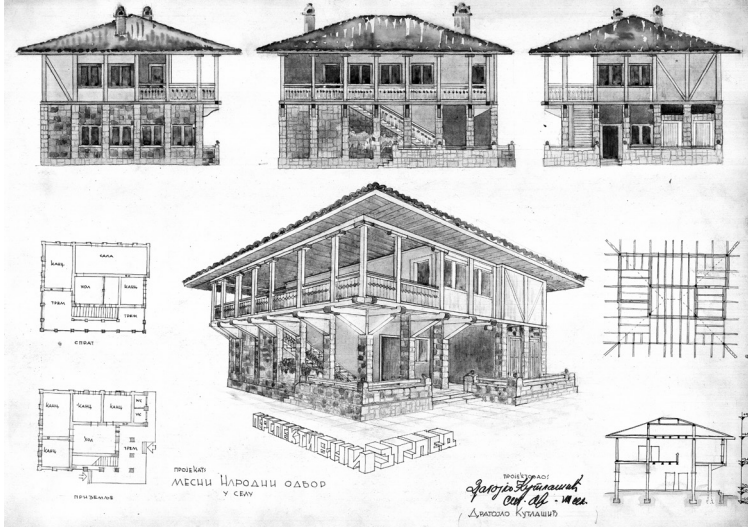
Project for the local national committee house in a village – ground floor, first floor, roof base, vertical section, facades and perspective view, student: Dragojo Kutlašić
